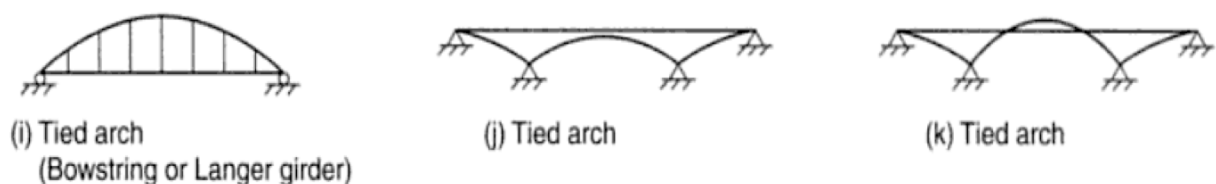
Tied arch bridge – alternative definition [4]
